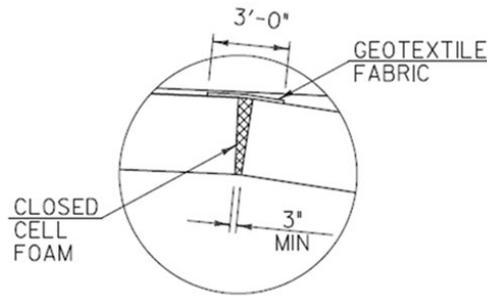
Vertical Abutment Crack at Stockbridge Bridge
